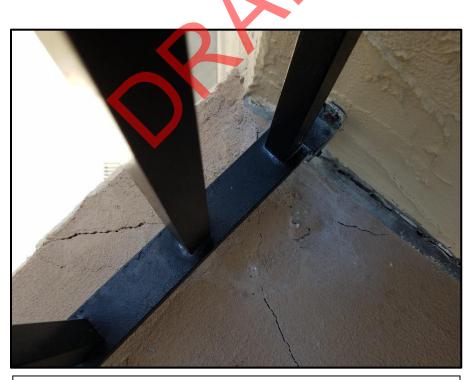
Unit #202, Sealant failure at unit wall perimeter.
